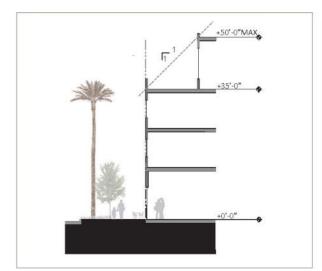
RETAIL MAIN STREET STEPBACK ABOVE 35 FEET
